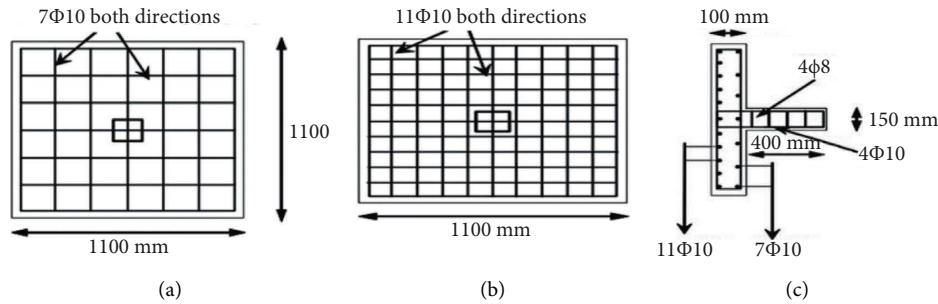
Reinforcement detailing of part-II specimen [11]. (a) Compression reinforcement. (b) Tension reinforcement. (c) Center line section.
